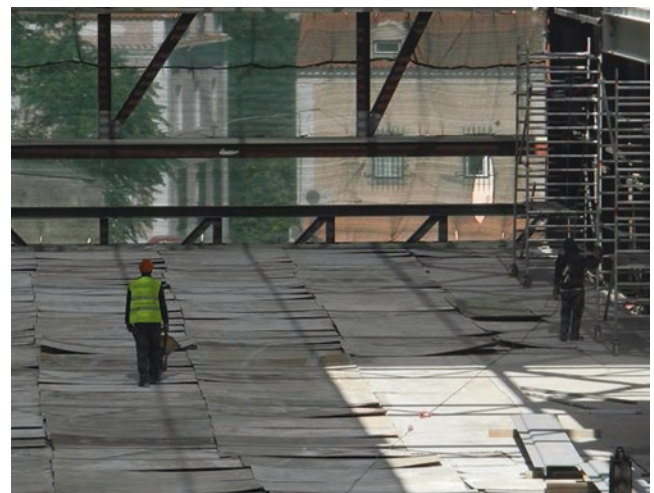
View of the slab of the main room of the museum in the structural construction phase
